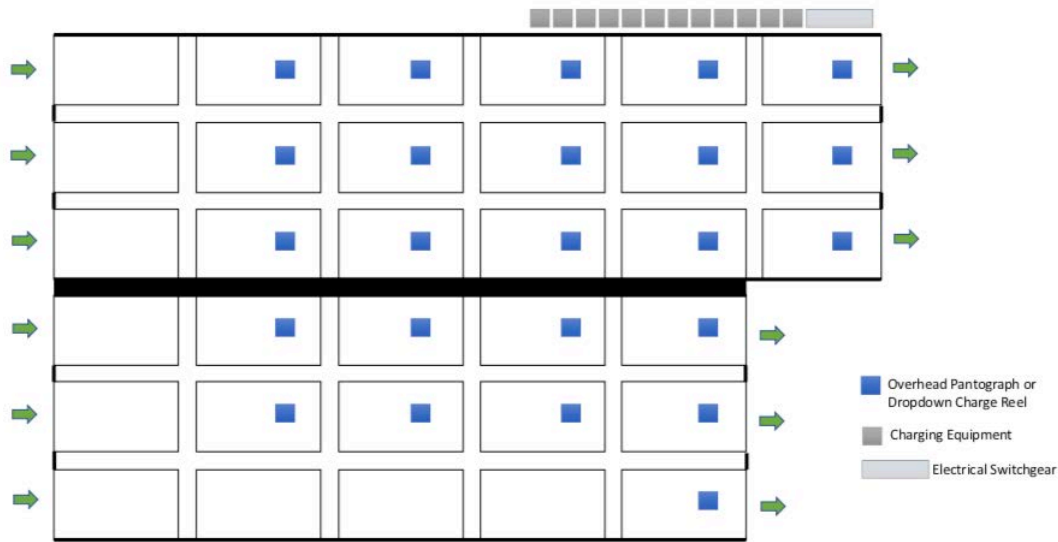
BEB Charging Storage Facility Conceptual Layout
